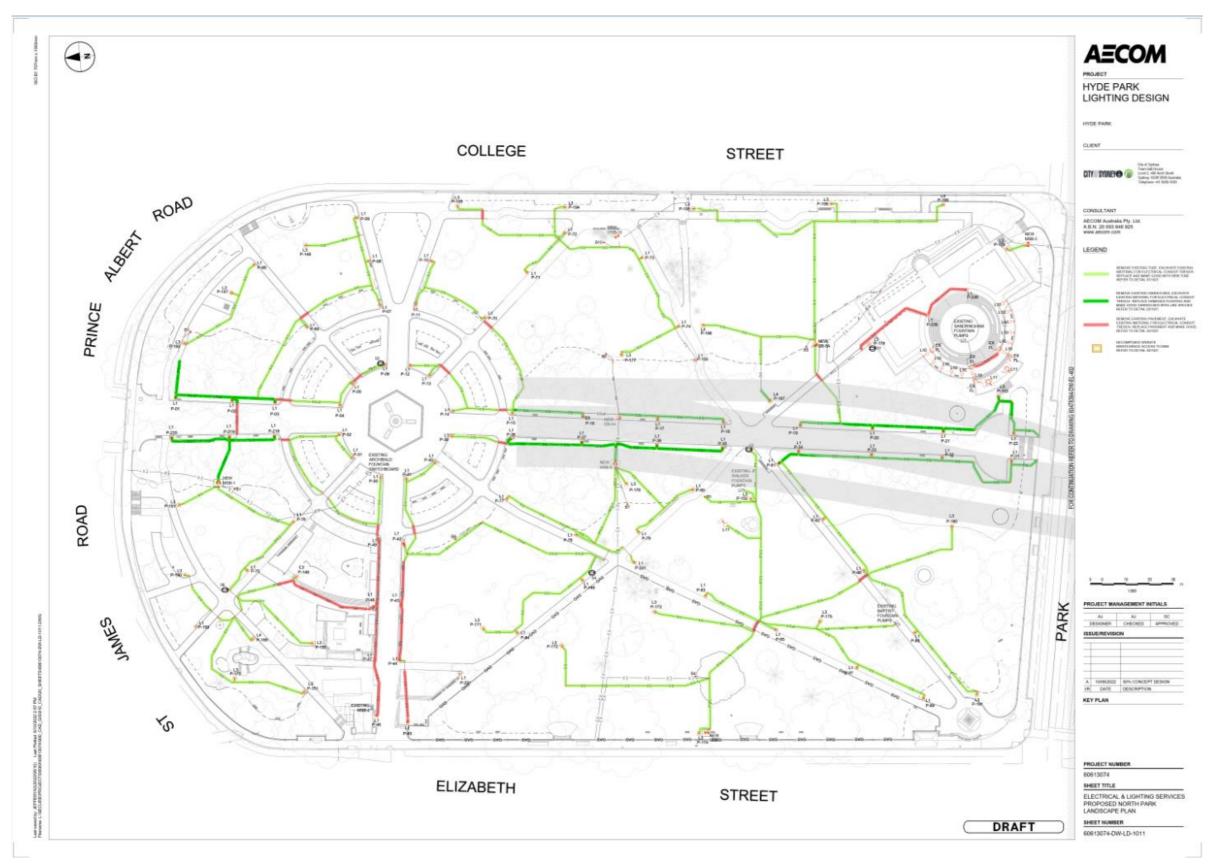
Trenching works for electrical pit conduits in Hyde Park North
